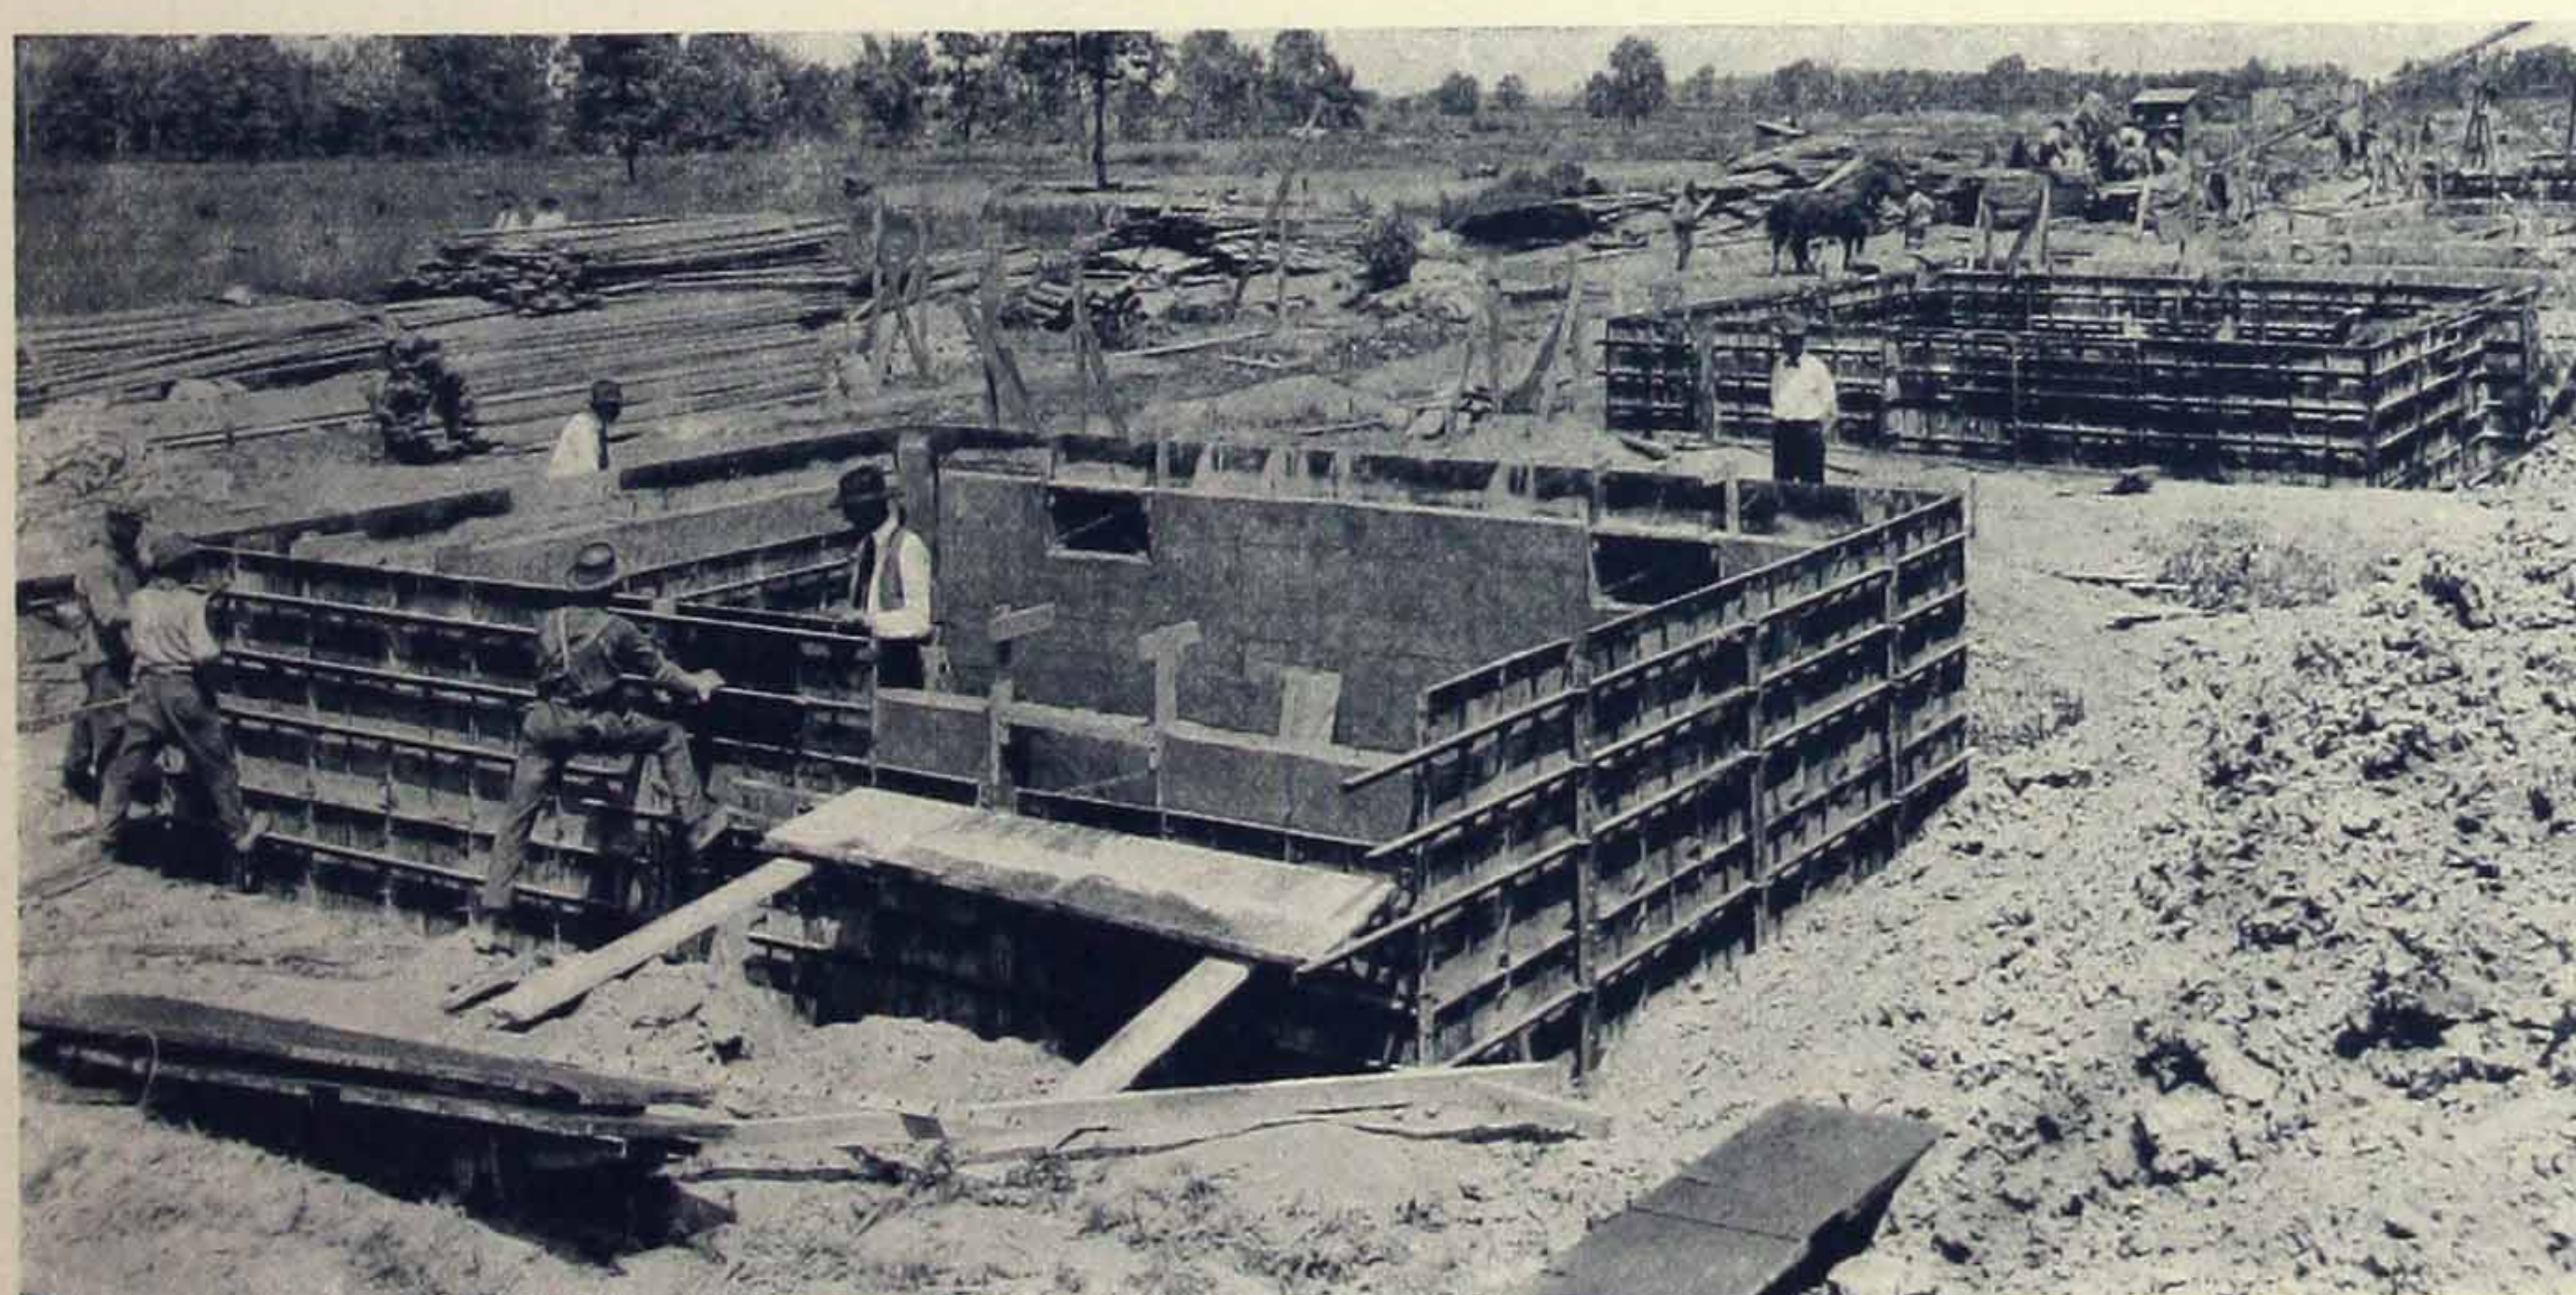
BLAW LIGHT WALL FORMS USED ON CONCRETE FOUNDATIONS
